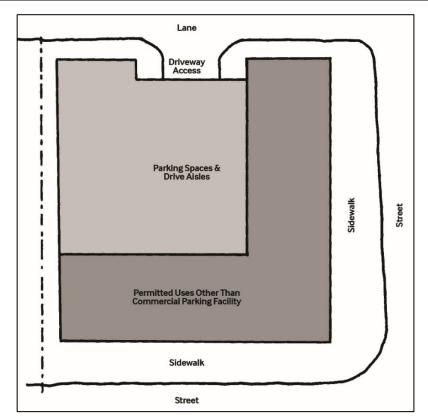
Location of Parking Spaces on the Ground Floor of a Building
